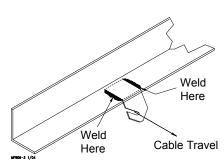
Welded Steel Truss Ceiling Bracket
